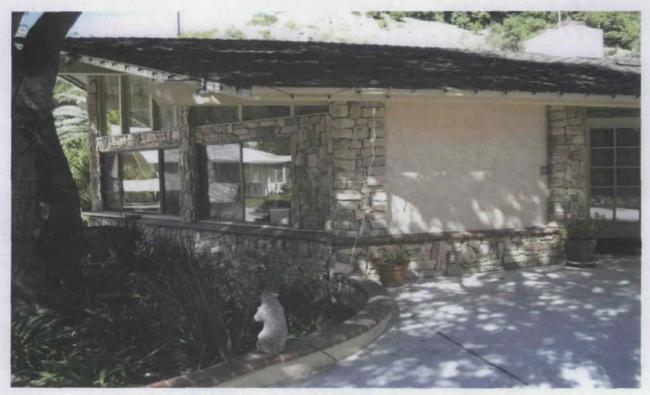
Stone & Stucco Replacement Siding On Office Building
